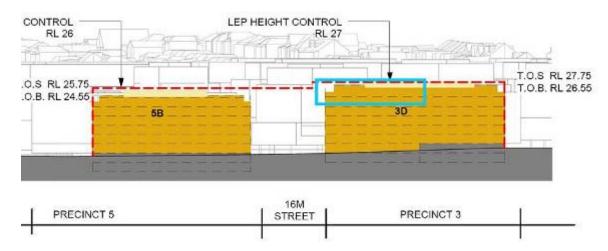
Western elevation (from The Crescent / Minogue Crescent) of Building 3D with the additional storey shown boxed.
